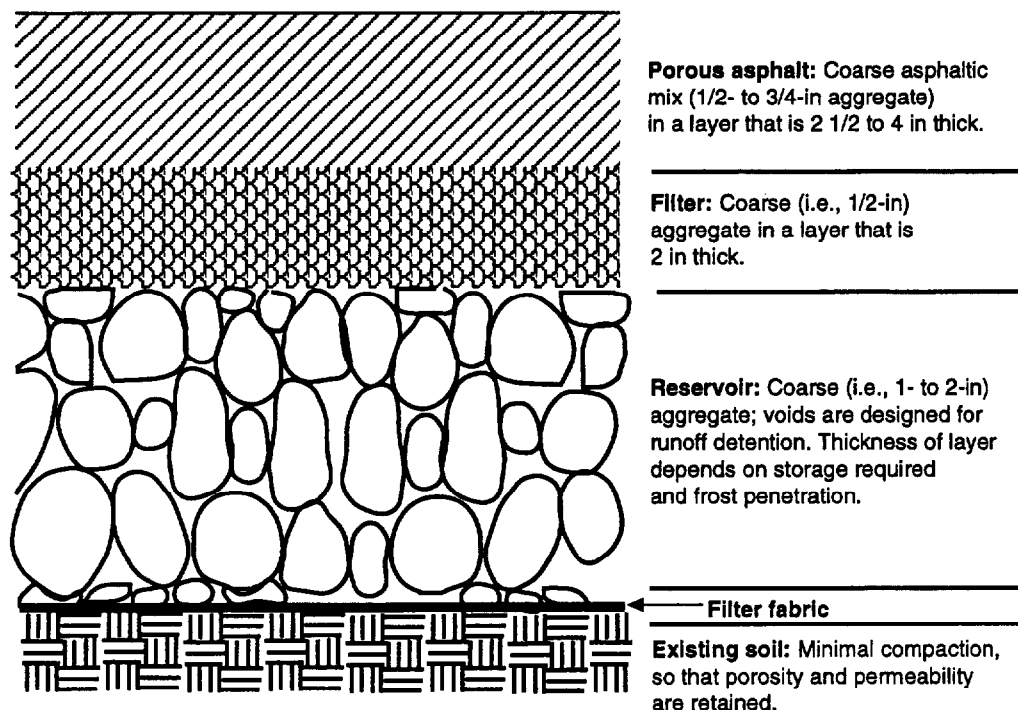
Porous pavement cross section (WA DOE, 1991).
